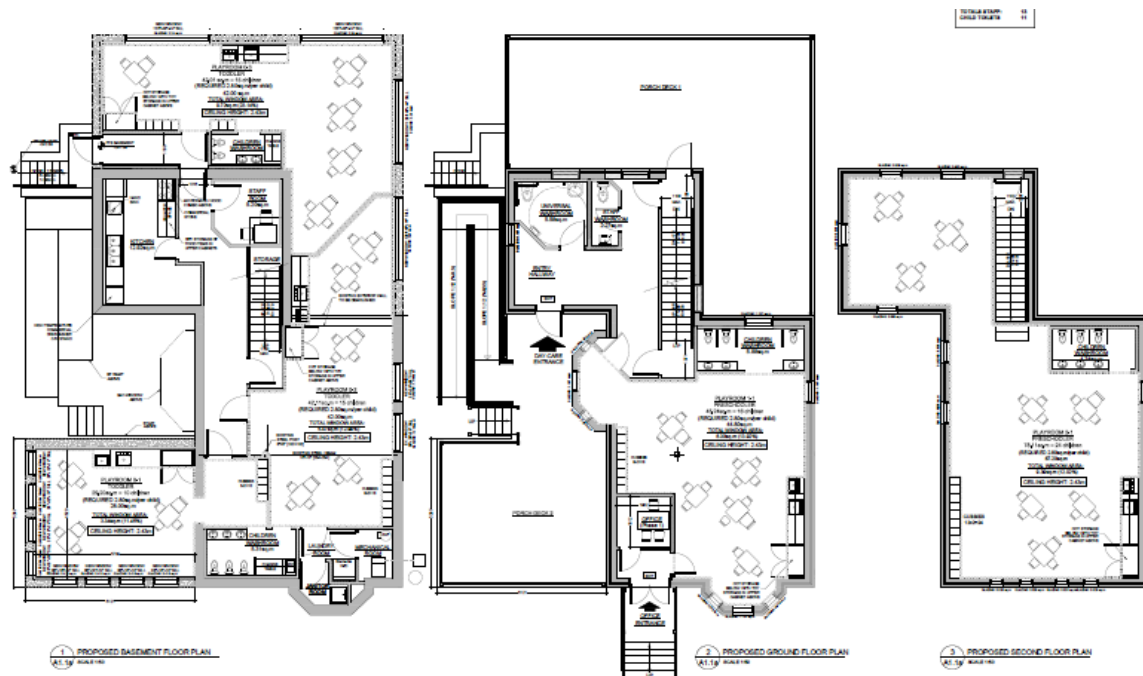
Floor Plans, Phase 1 Armstrong House Daycare (AREA, May 1, 2024)
